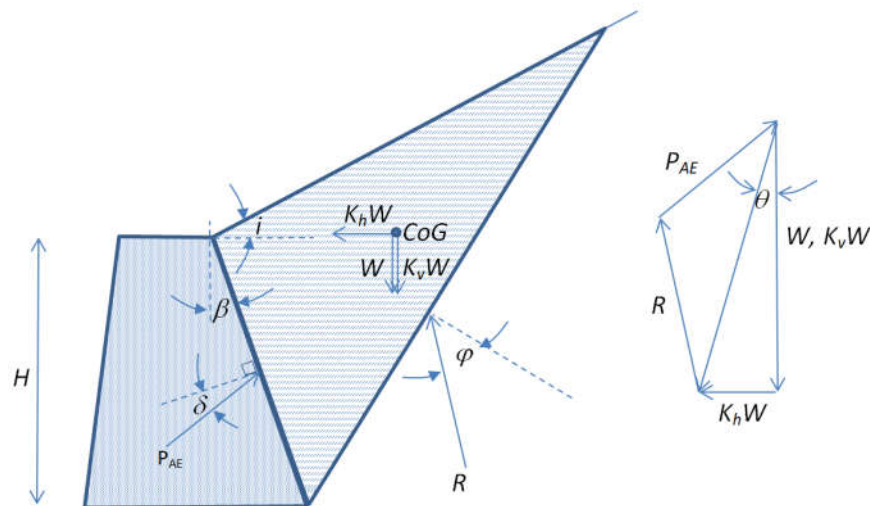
Stability checks for reinforced concrete retaining walls.
